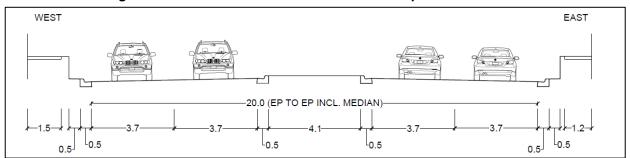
Existing Cross-Section of Cawthra Road at CN Underpass
